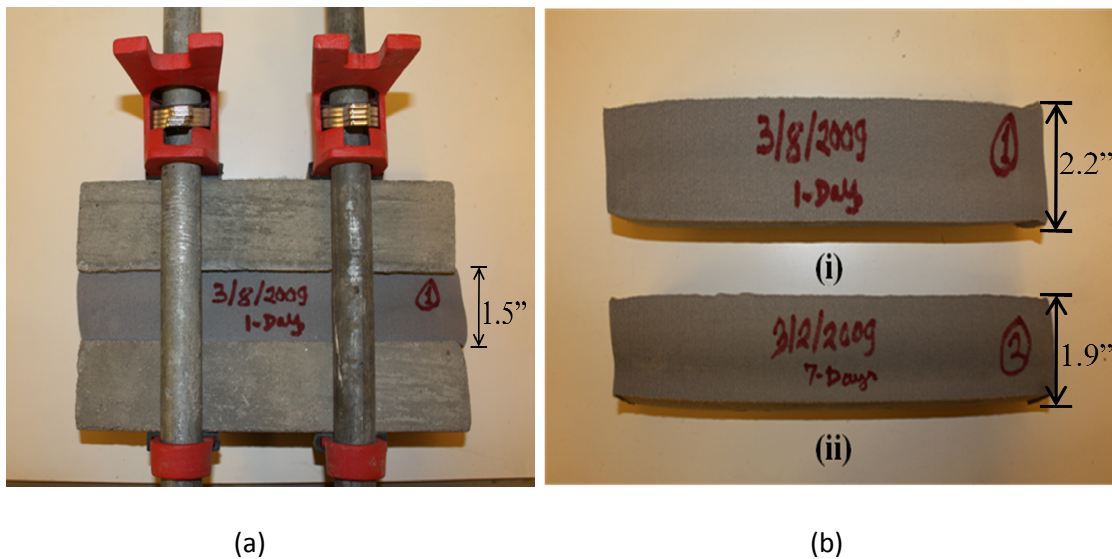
Failed adjustable haunch specimen during tension test.
